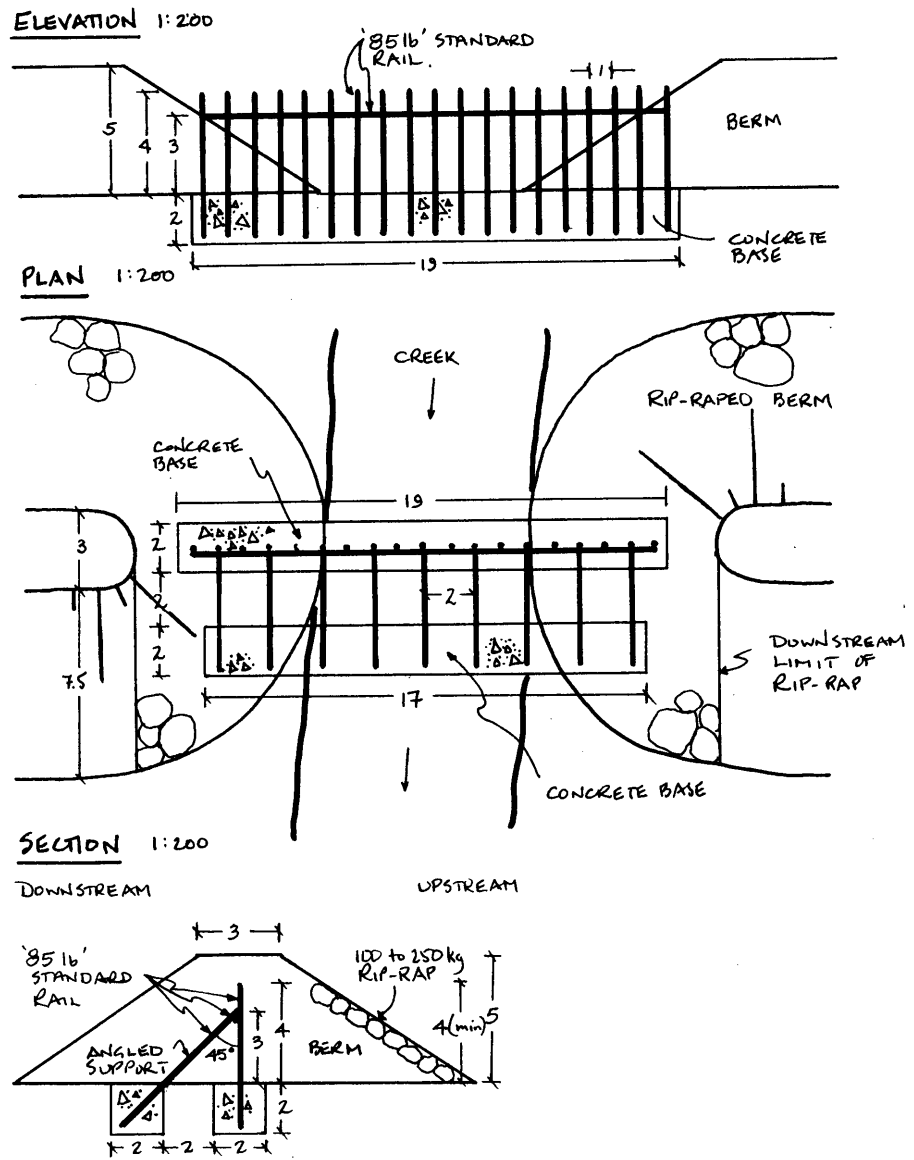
Details of rail and concrete debris-straining structure.
